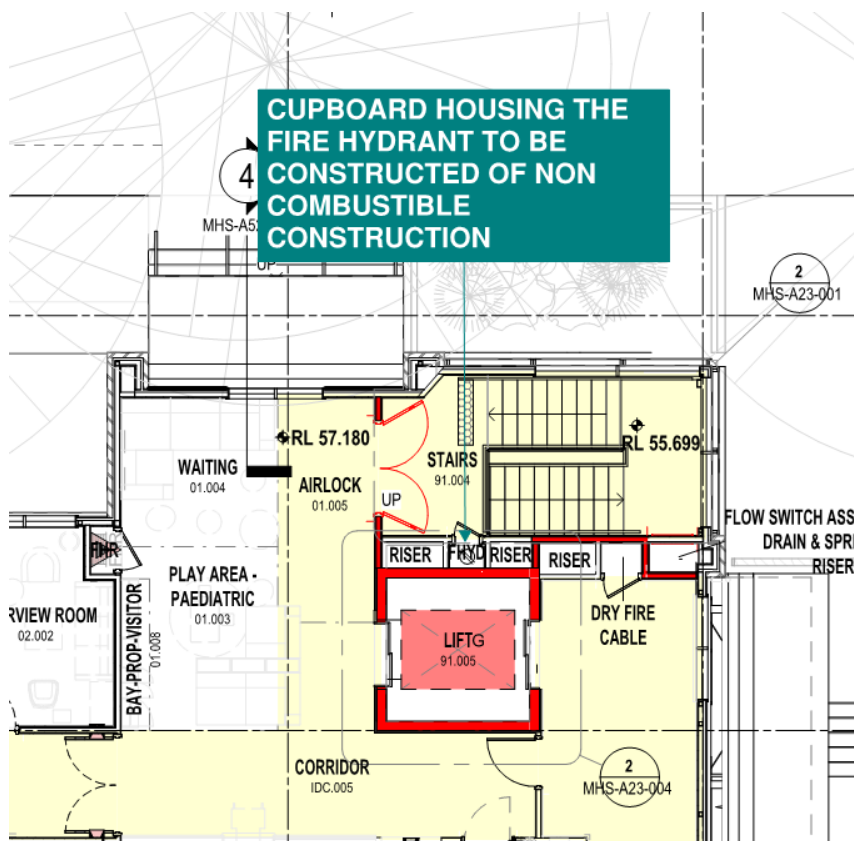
Fire hydrant housed within cupboard on Level 02 of the fire isolated (separated) stairway
